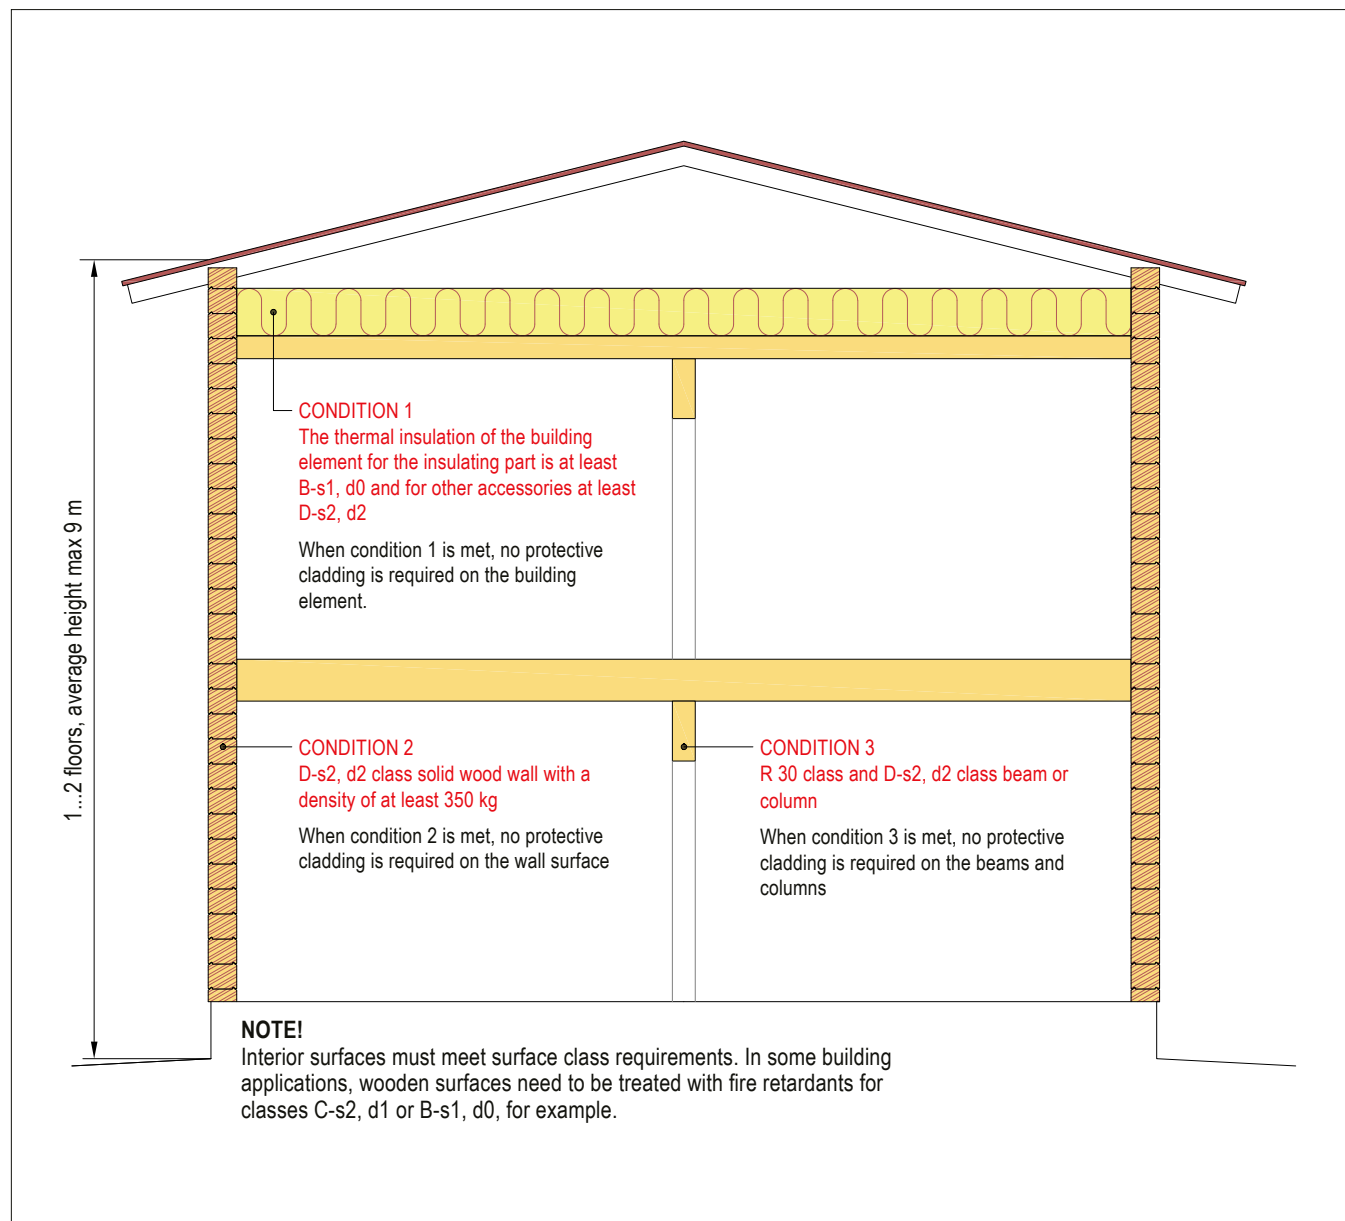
Conditions under which internal protective cladding can be left out in a 1...2-floor P2 fire class log building.
